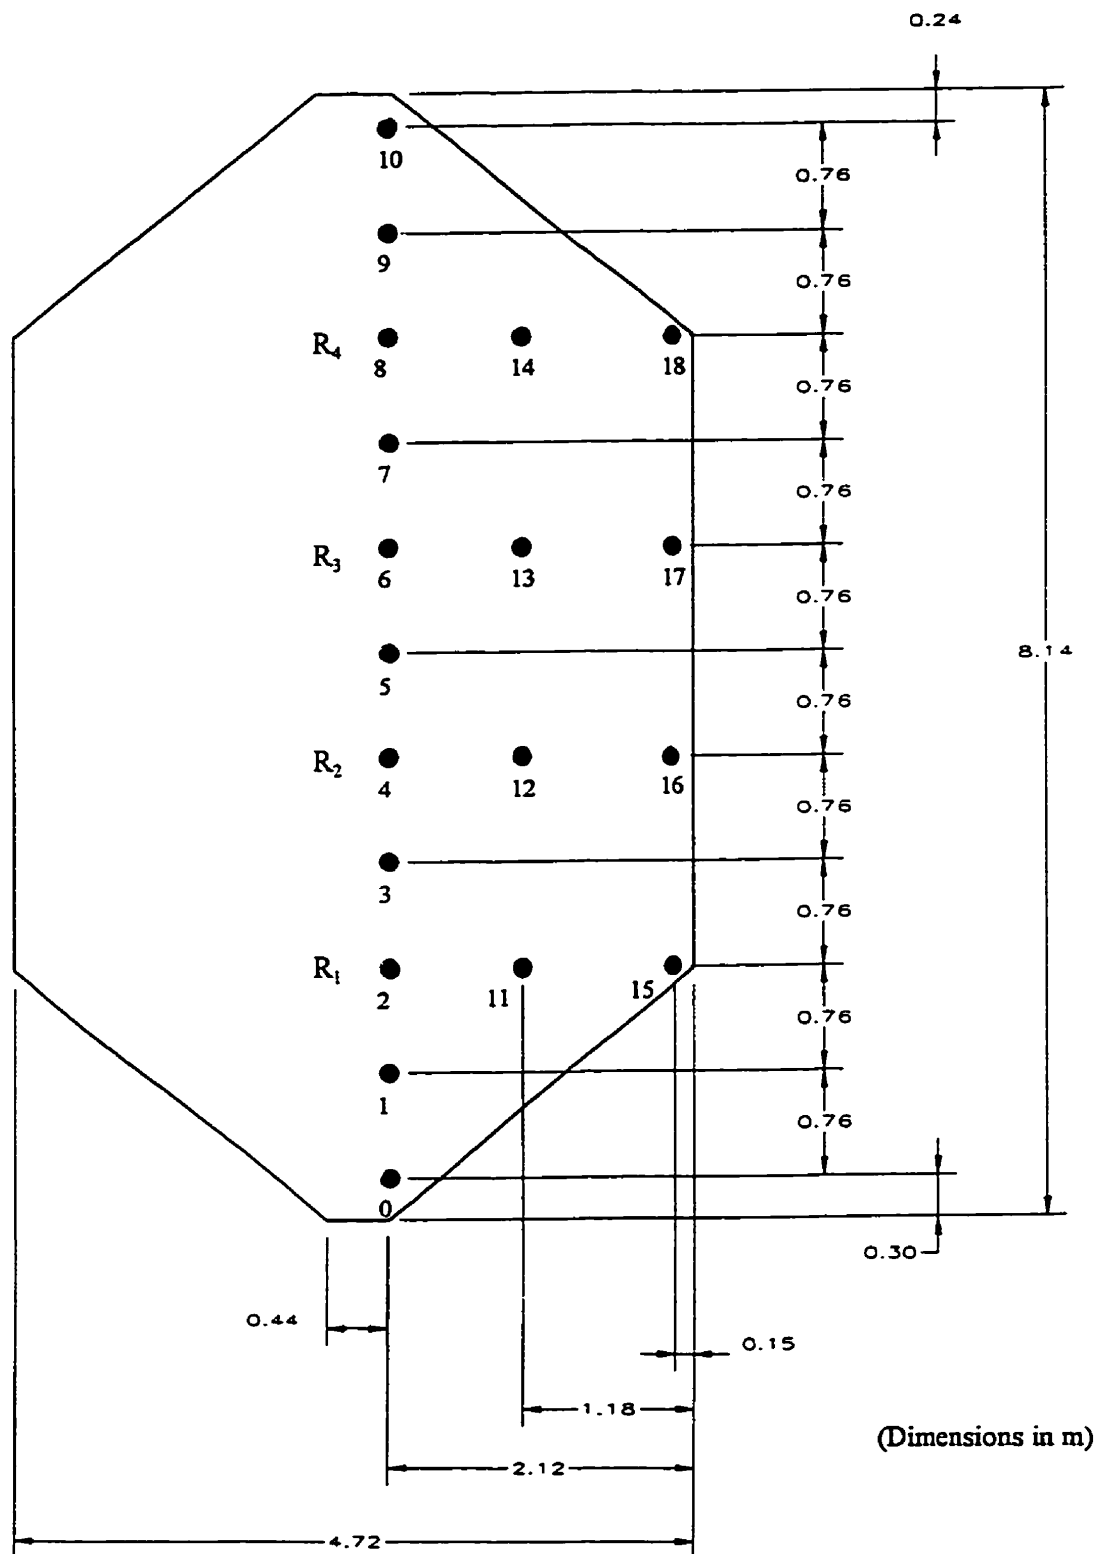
Locations of sampling points in the instrumented welded-steel hopper bins.
